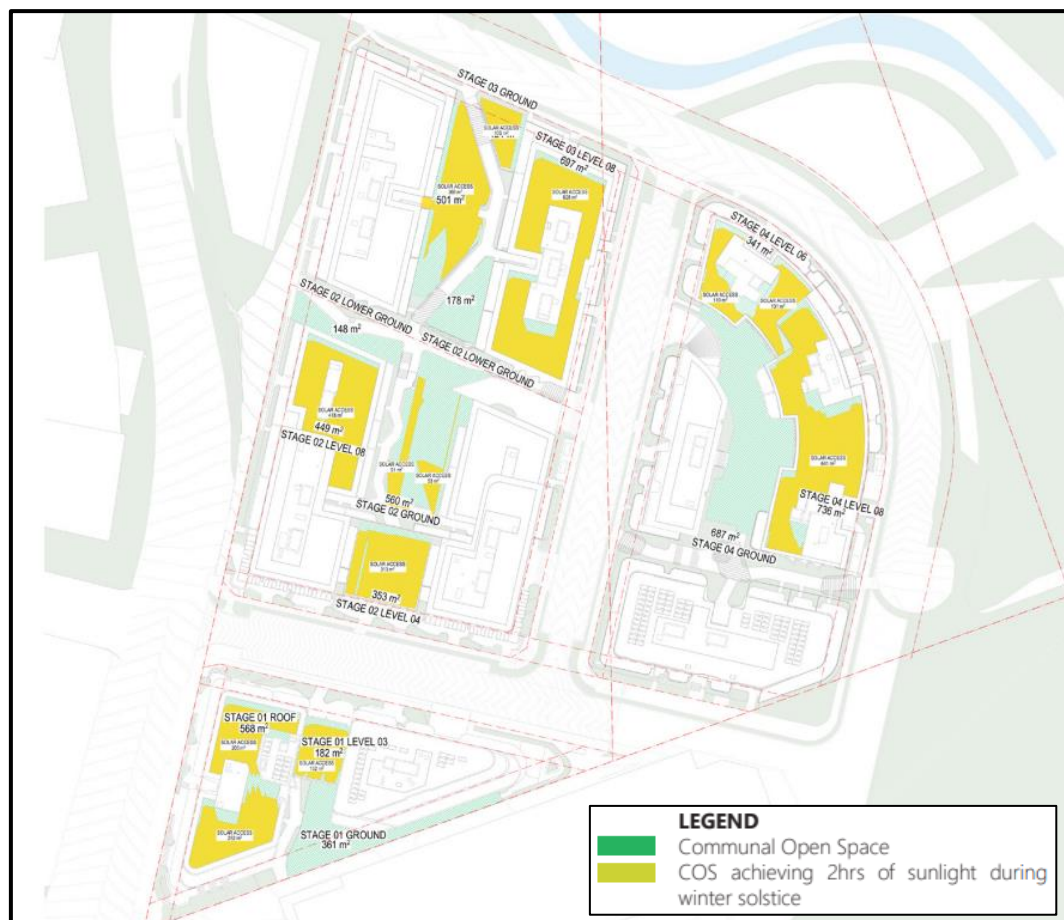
Proposed communal open space excerpt indicating a range of ground floor green spaces and rooftop communal open spaces
